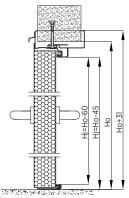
Installation of a single-leaf door to a masonry wall – wrap-around frame with a thermal break – vertical cross-section
